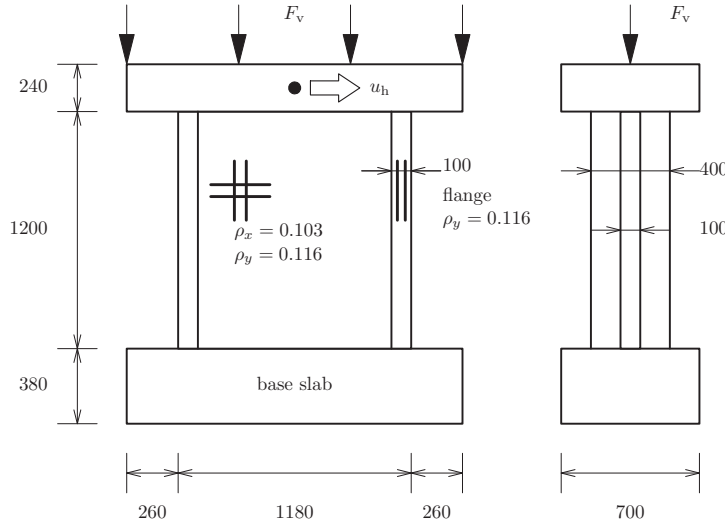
Shear wall panel – geometry and boundary conditions (measures in mm)
